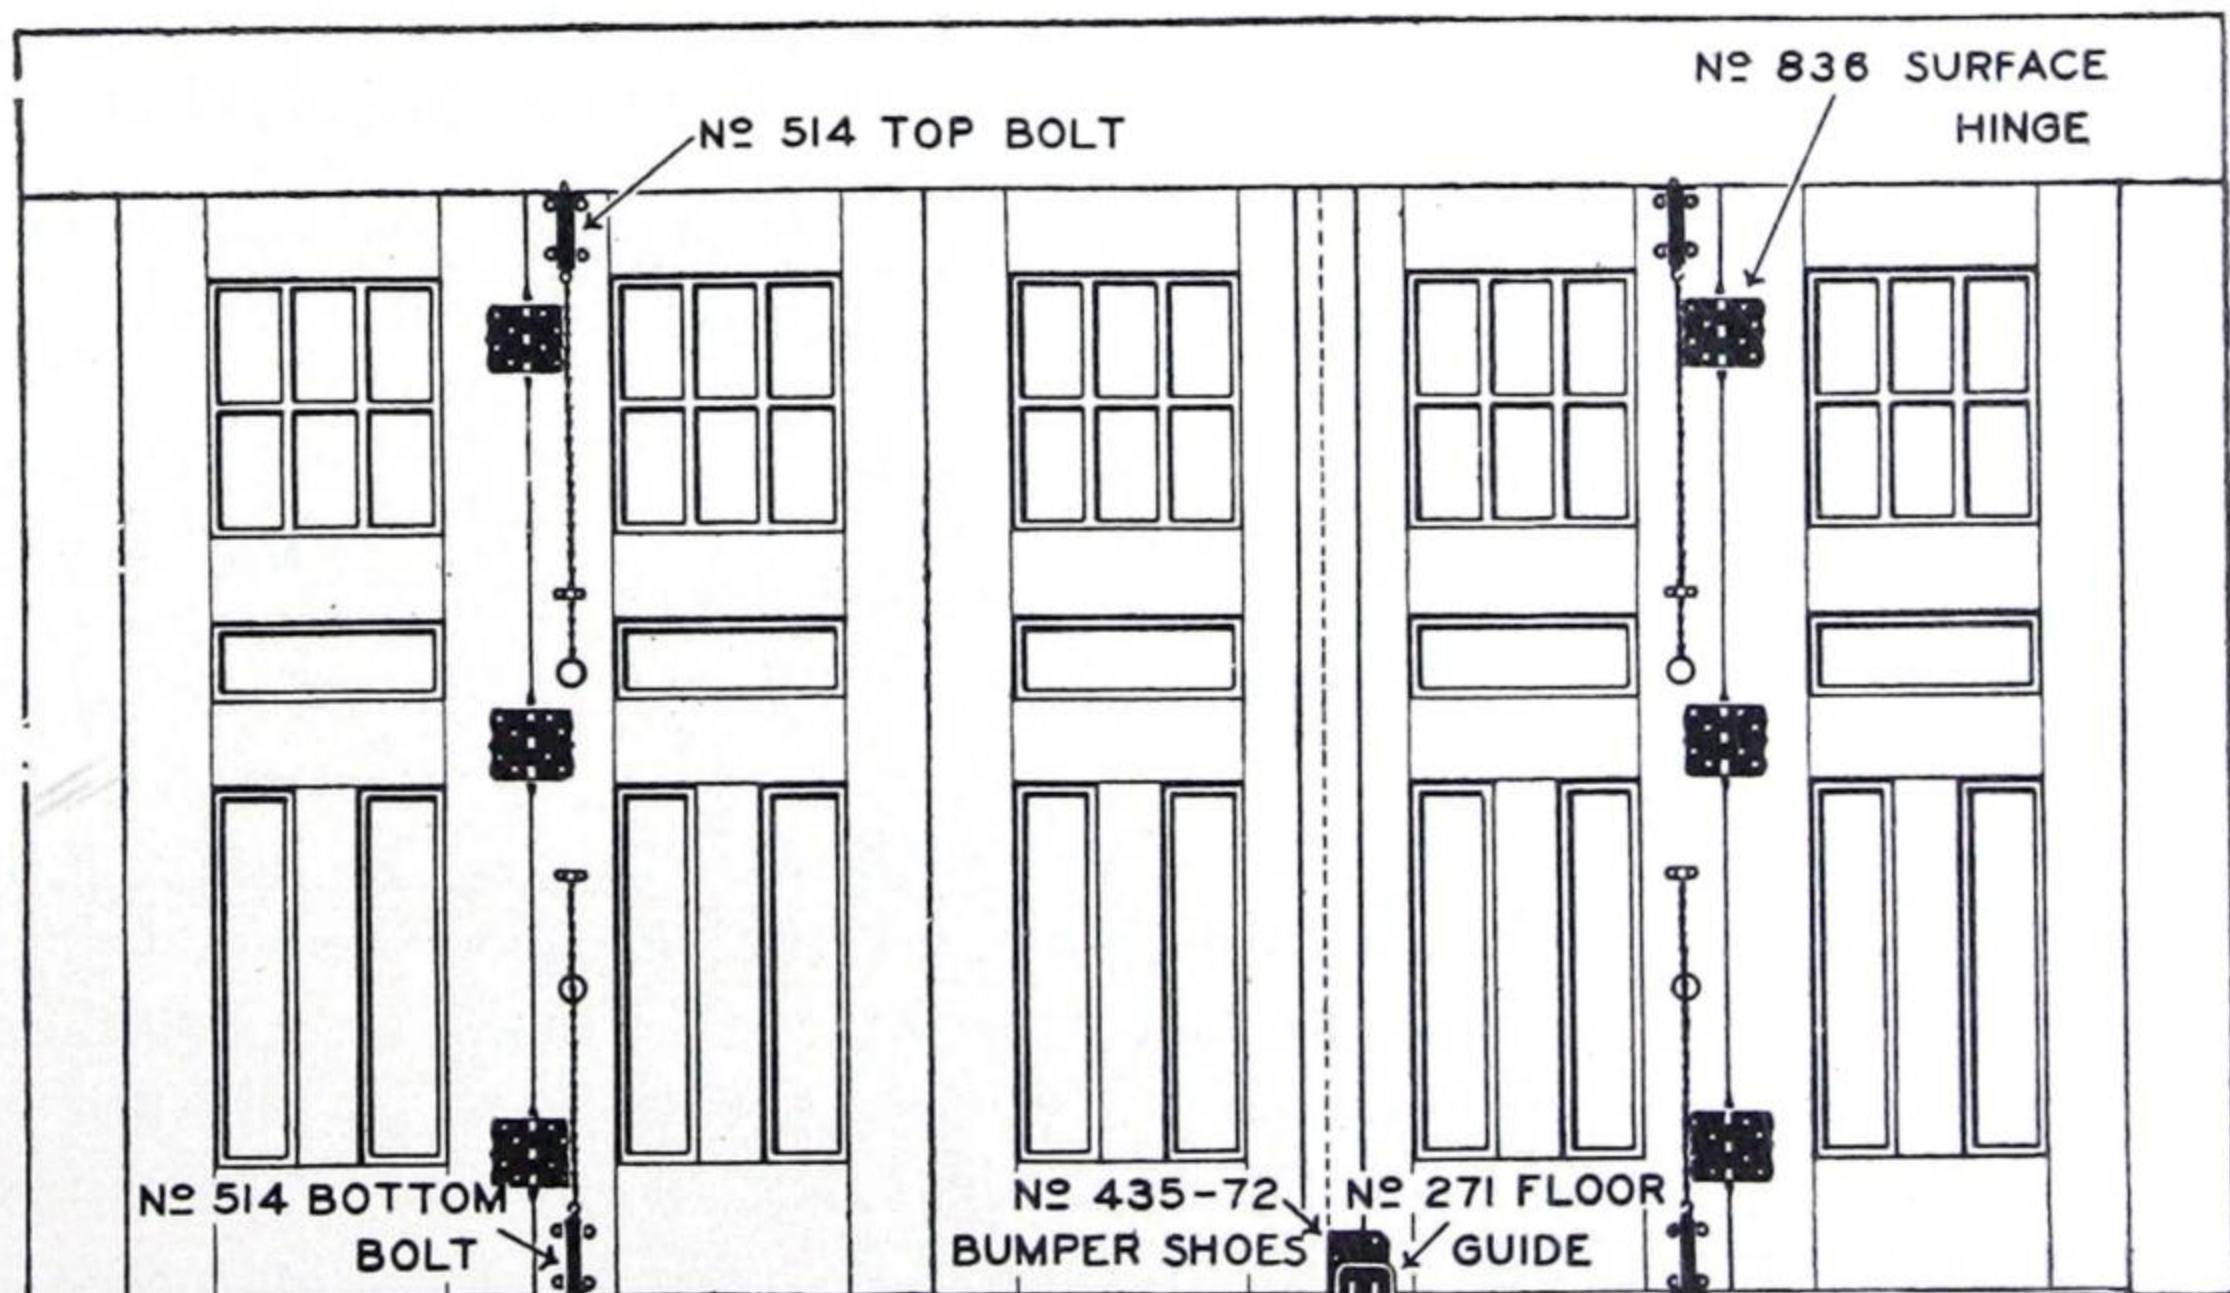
Interior View of above elevation showing proper location and names of 435 Parts as used on the inside of a 5-Door Opening Out Set. No. 414 Bolts are applied the same as are the 514 Bolts.
